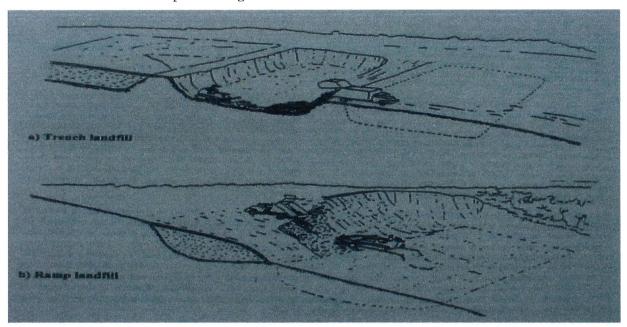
Trench and ramp landfill filling schemes⁷⁶
